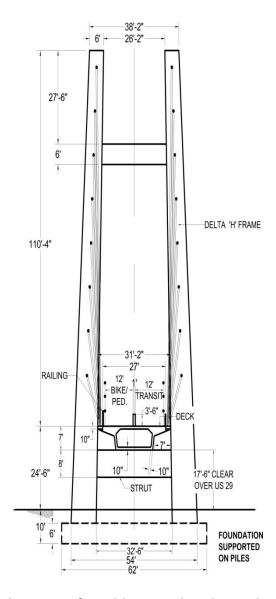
Typical Section of a Cable-Stayed Bridge with One Transit Lane
